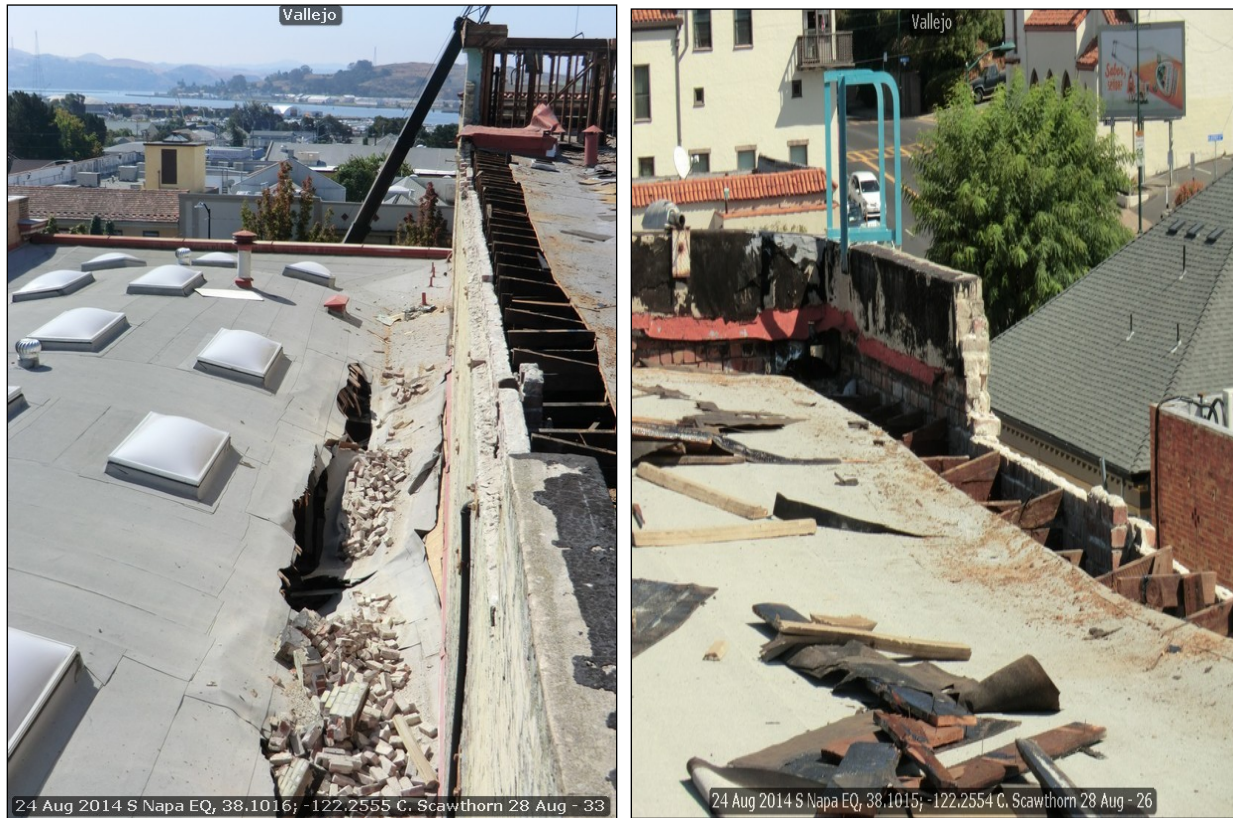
Roof of URM building shown in Figure 19, showing approximately 3 ft. by 40 ft. long section of parapet, which fell approximately 15 ft. onto and through neighboring building roof.
